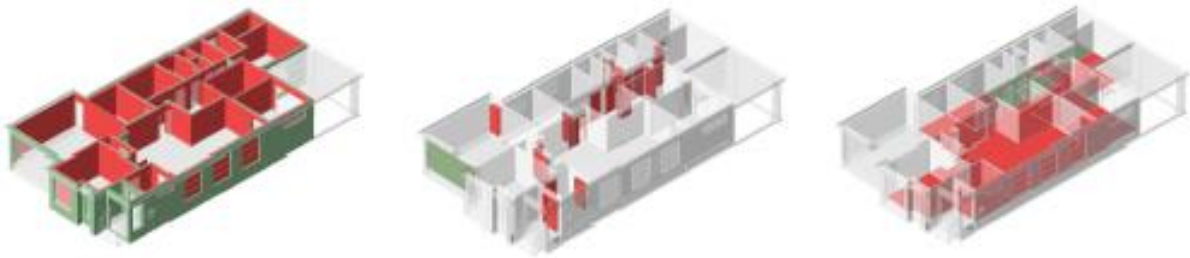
3D Visualization of damaged walls (left), doors (middle) and flooring (right) (Source: Amirebrahimi et al. 2016)
